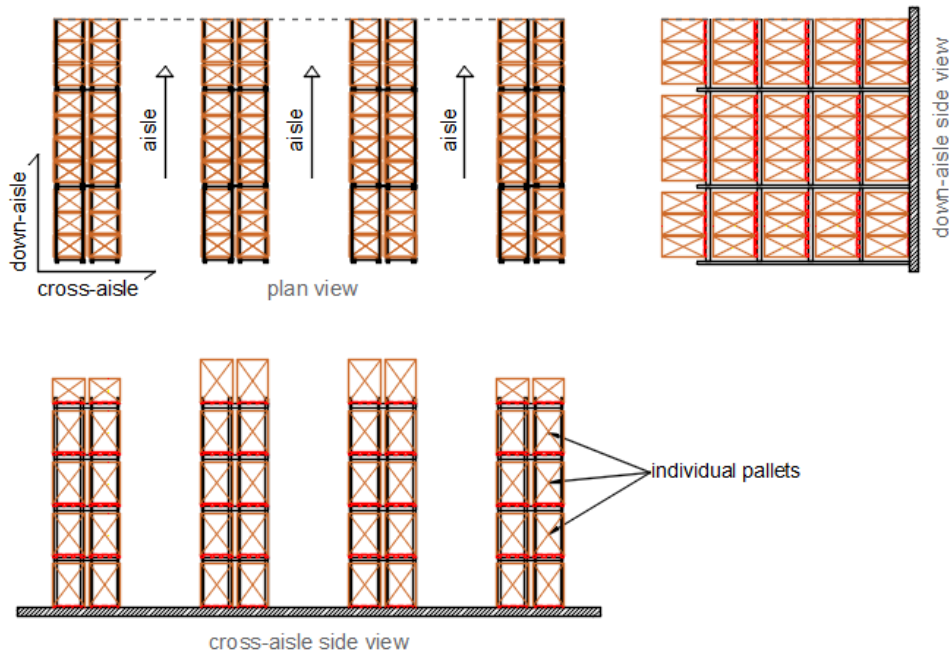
Plan and side views of a typical racking system. Two directions are defined, the down-aisle, which is used by the forklift trucks and, perpendicularly, the cross-aisle.
